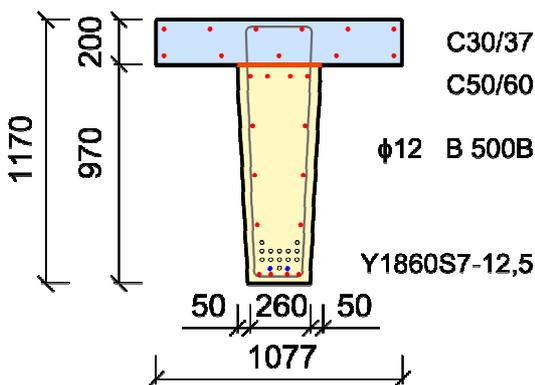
Cross-Section of Concrete Composite Bridge Beam
